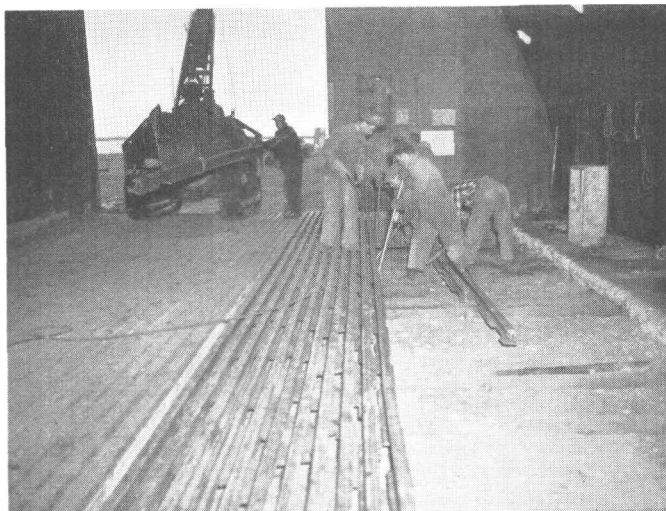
Rails being placed in concrete to form floor of sled shop at Barrow, September 1950. Photograph by U. S. Navy.
